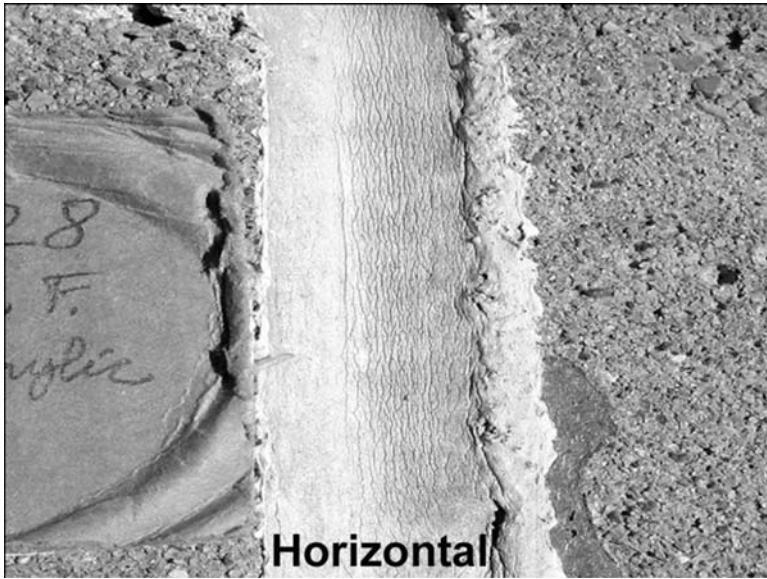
Acrylic sealant in a horizontal parapet joint showing slight surface wrinkling or crazing.
